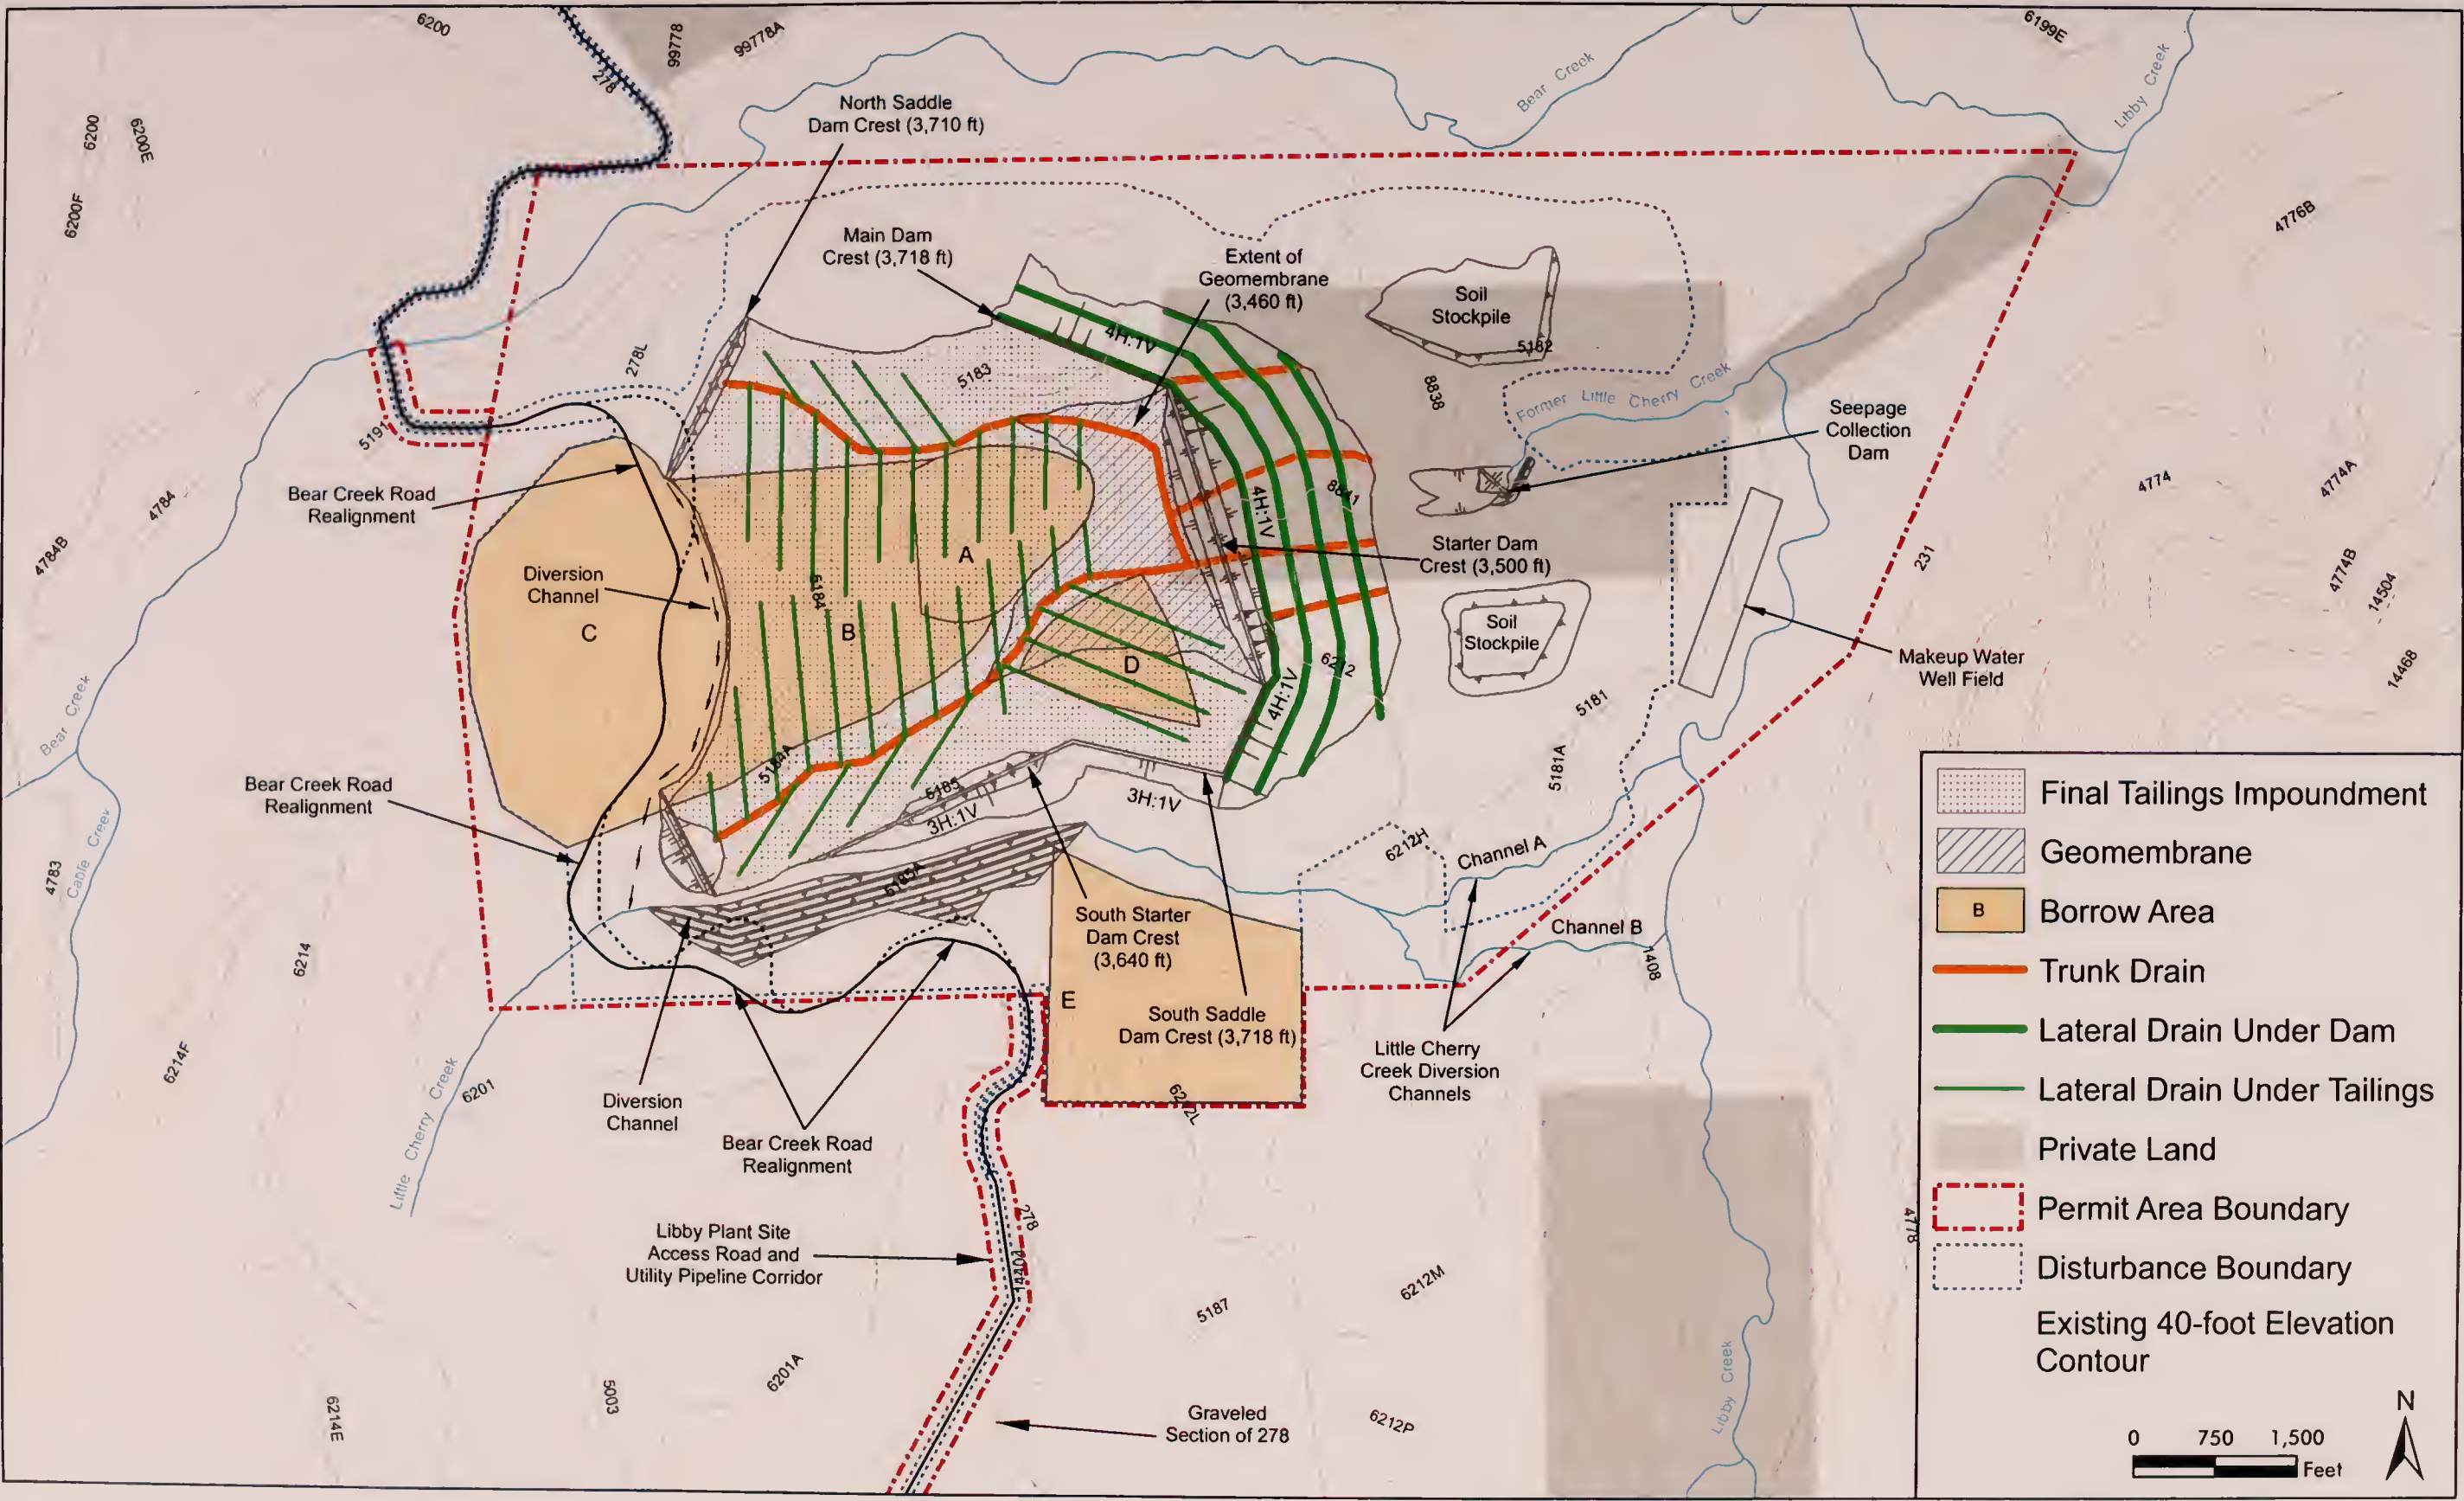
Little Cherry Creek Tailings Impoundment Site, Alternative 4
